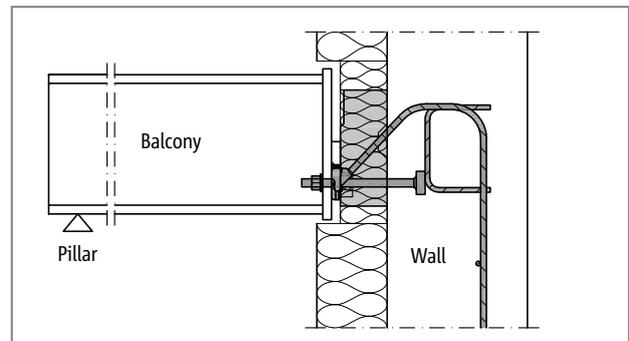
Schöck Isokorb® T Type SQ-WU: Special design; required for the connection to a reinforced concrete wall
